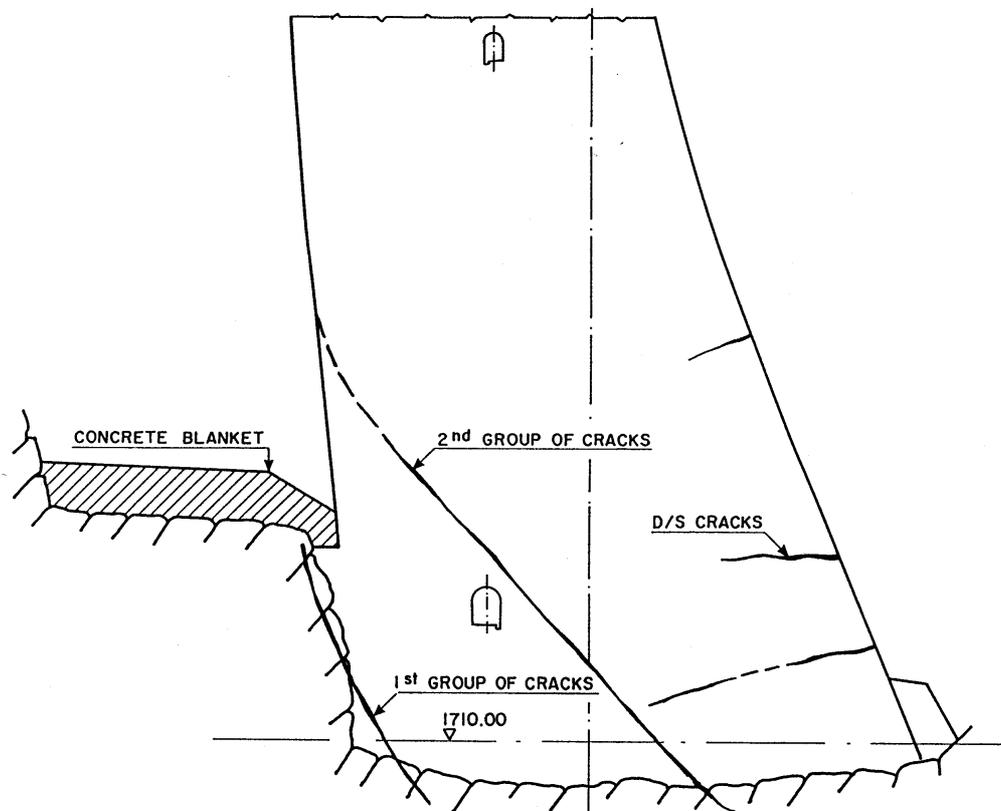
Kölnbrein dam. Typical cracks in the dam blocks.
